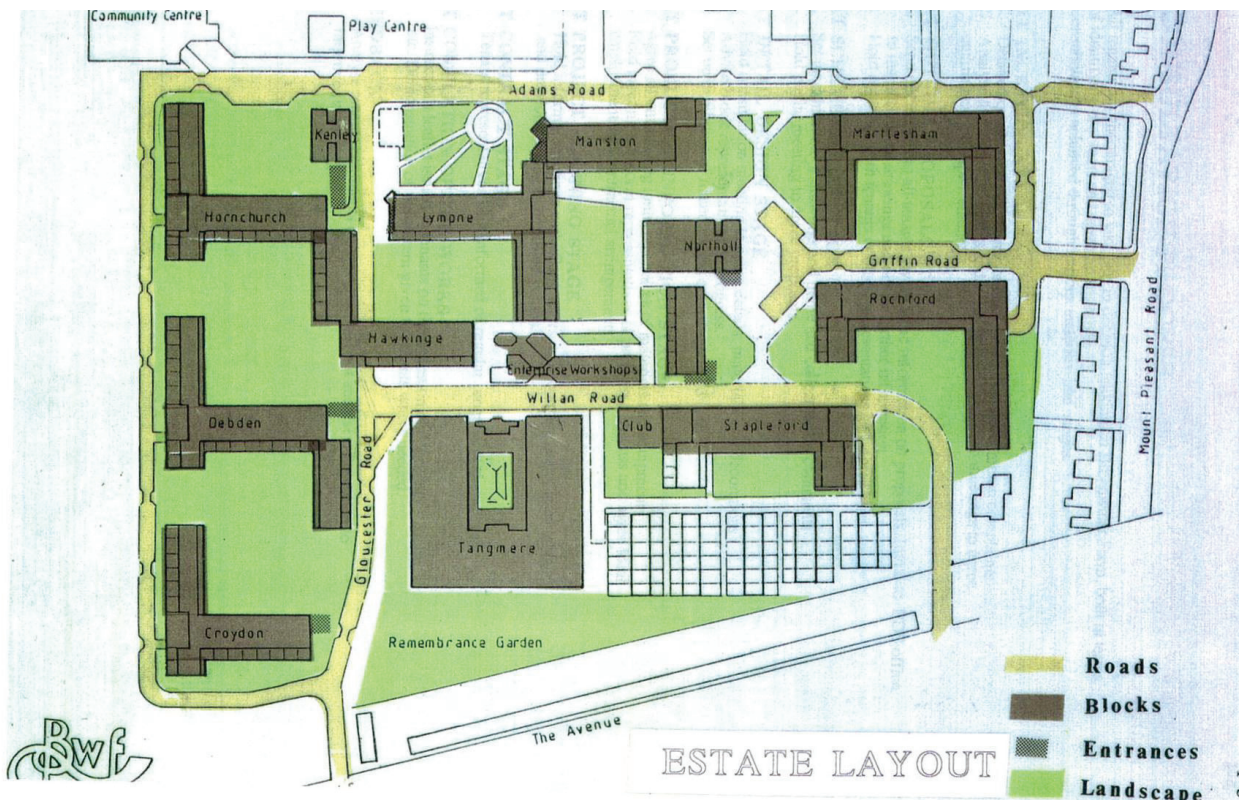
Broadwater Farm Estate Layout (Haringey Council Building Design Service, 1985)
